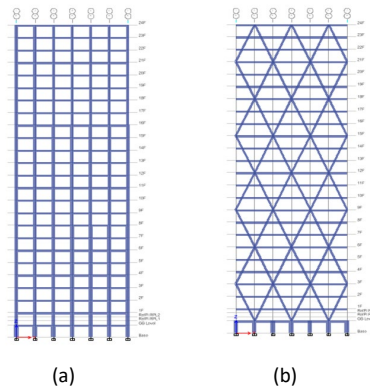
Elevation view (a) Rigid Frame Building (b) Diagrid Building
